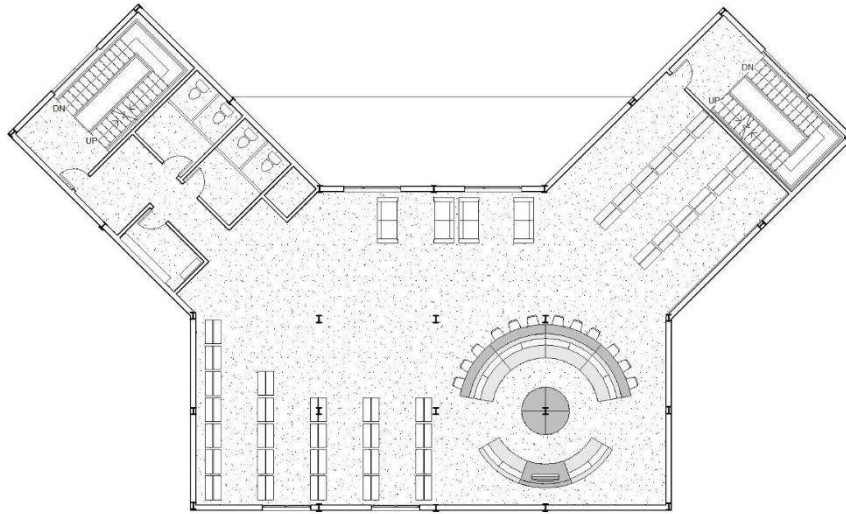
2<sup>nd</sup> Floor Floor Plan
